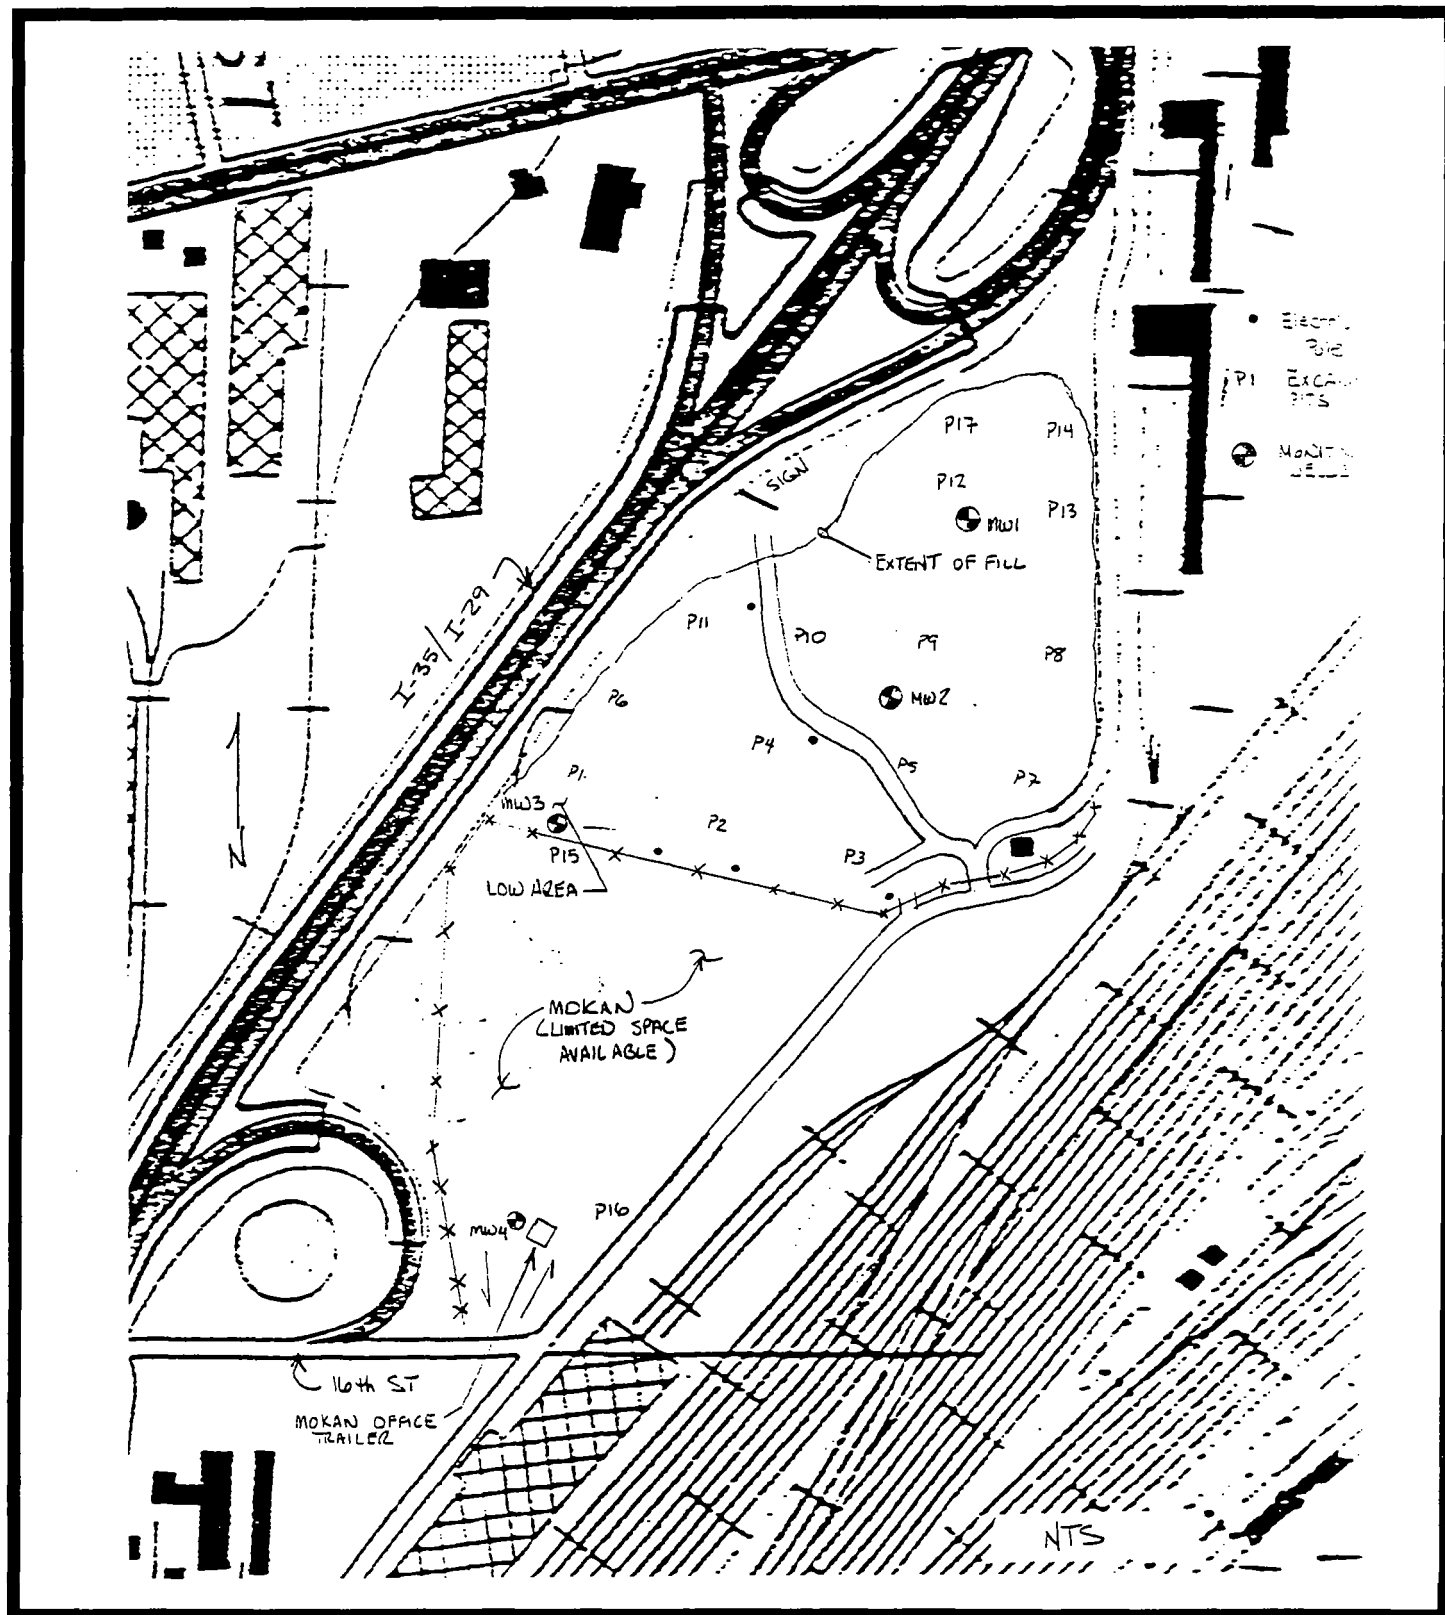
EXCAVATION AND MONITORING WELL SITES
